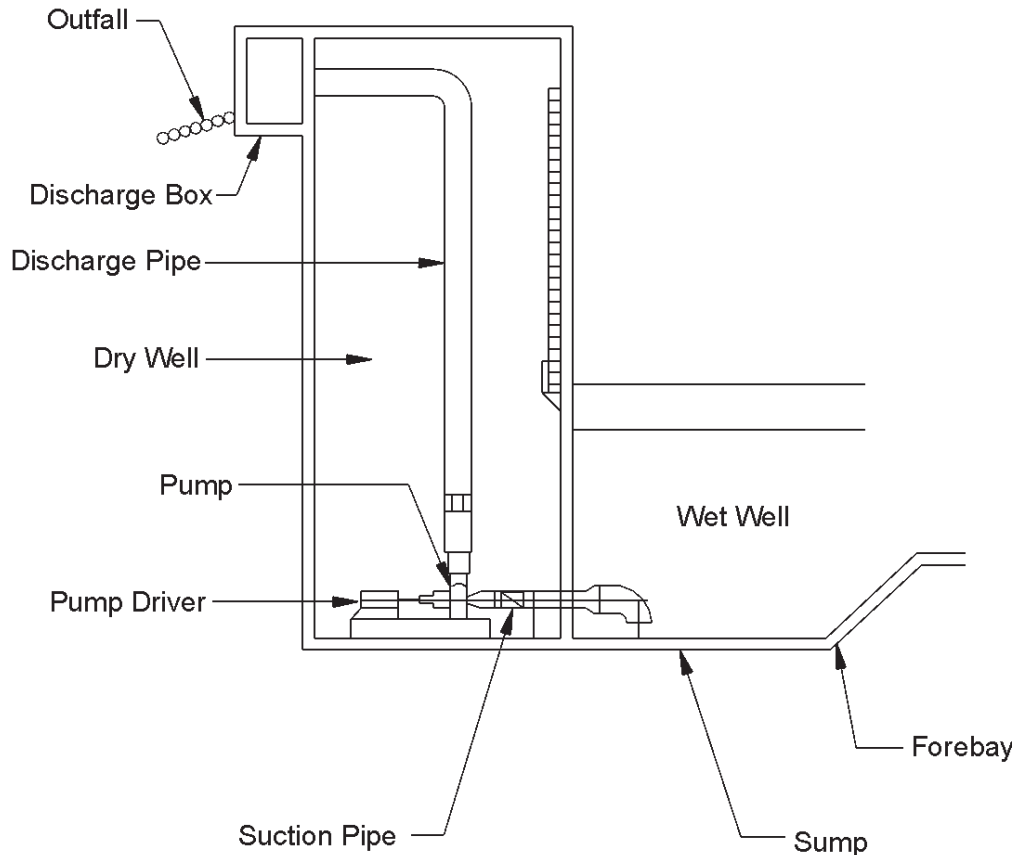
Typical Dry-Pit Station, Source: HEC-24
